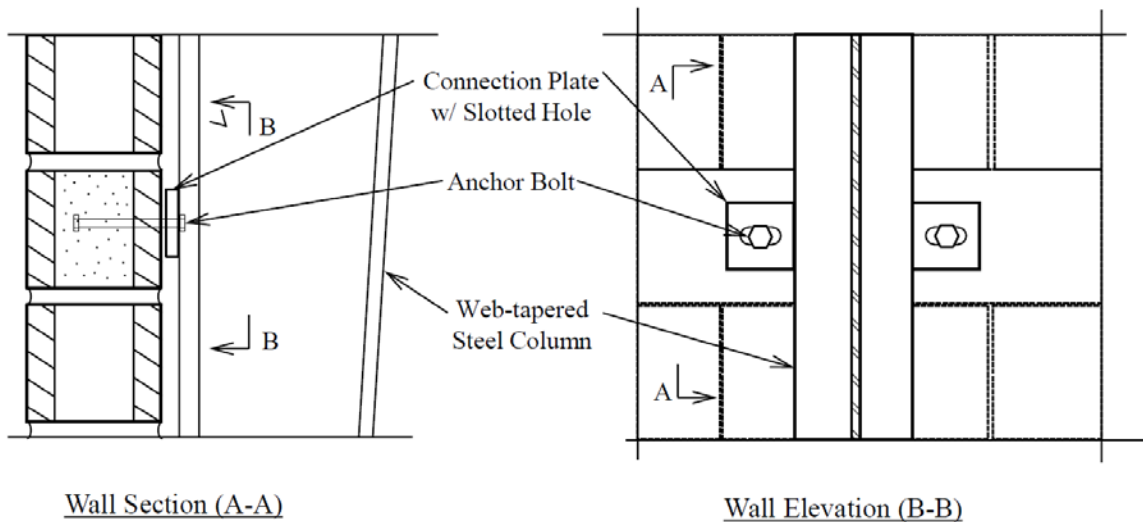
Steel Column to Masonry Wall Connection with Long Slotted Holes
